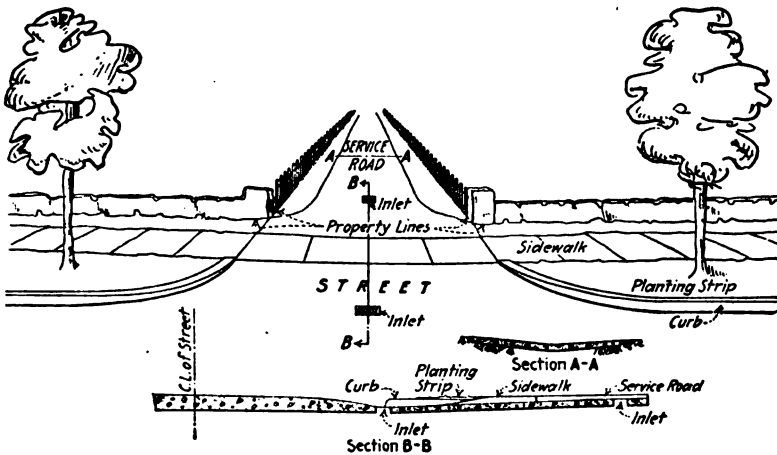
A suggested design for the intersection of a service road, or alley, with a street; the enlargement of the alley pavement at the intersection, and the flush sidewalk crossing are desirable features.
